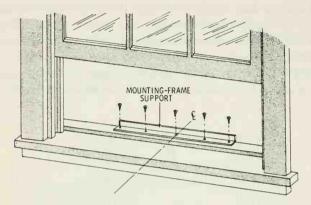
The method of fastening the mounting-frame support to the window sill.
